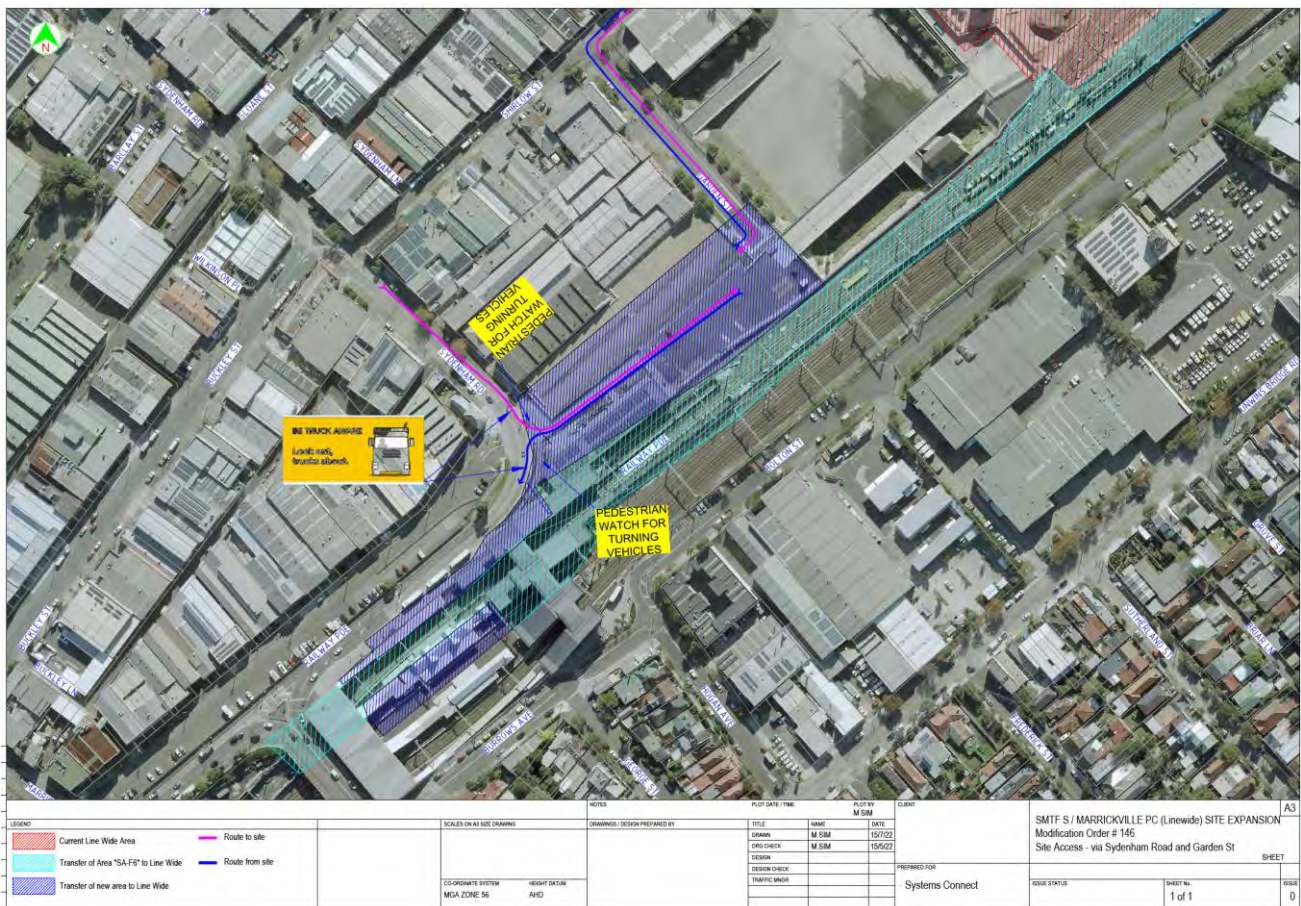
Access into the Sydenham Station via Sydenham Road and Garden Street
